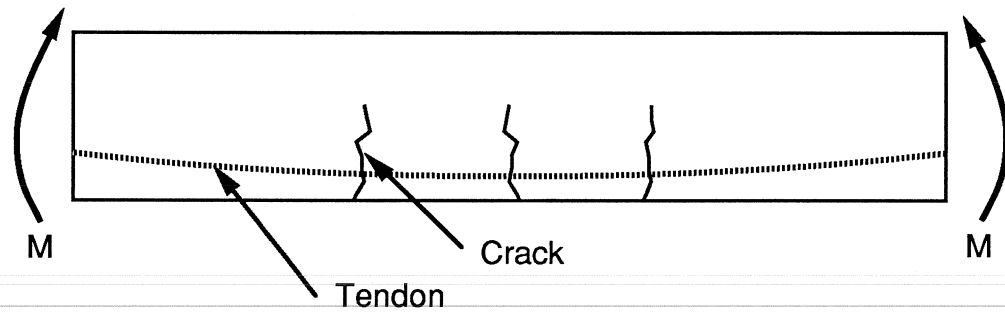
Variation of Tendon Stress in Prestressed Concrete Beam Sections
